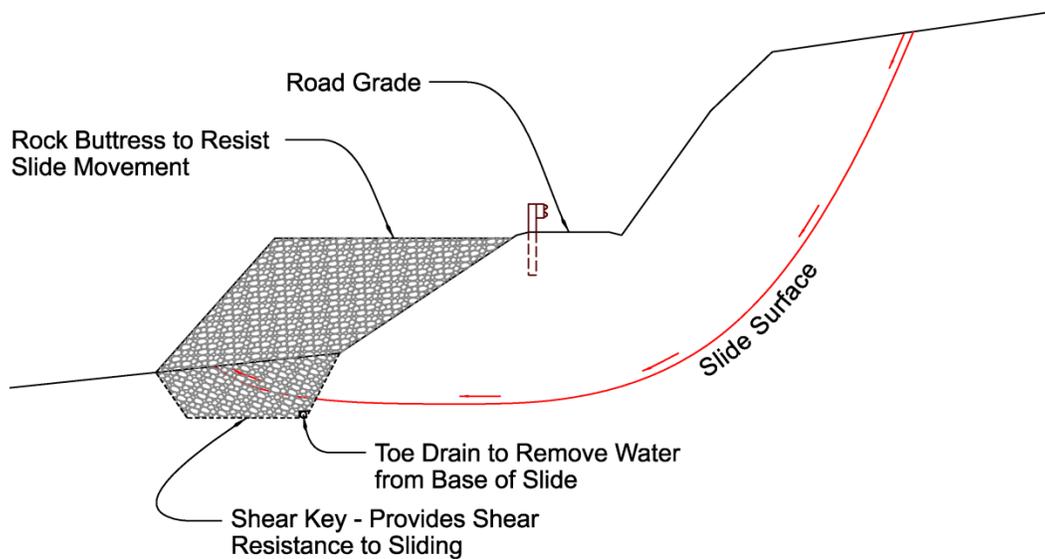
Stabilizing a landslide by constructing a shear key and buttress (Source: ODOT – Geo-Environmental Section)
